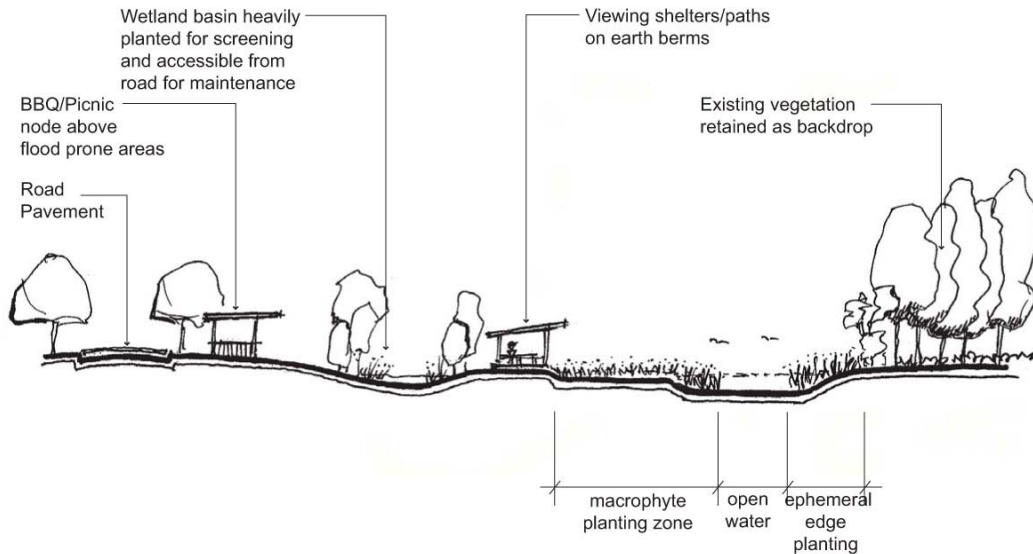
G: Typical Landscape Treatments to Constructed Wetlands in Open Space Areas
